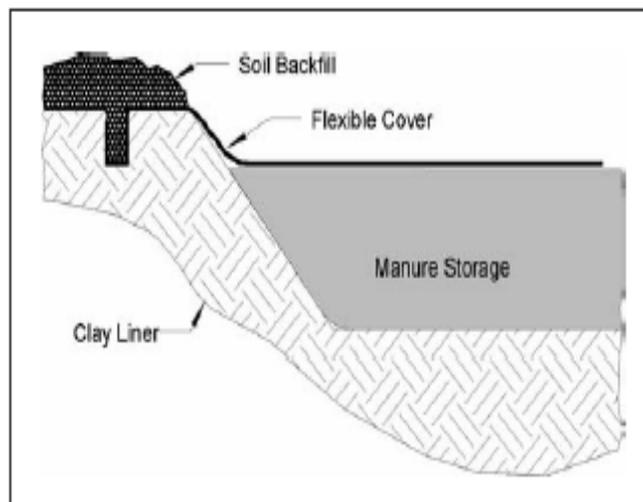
Fastening a cover to a berm using anchor trenches (Nicolai et al., 2002)
